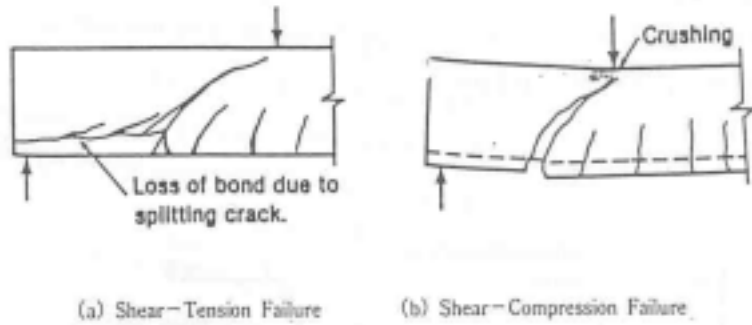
Failure modes of short shear span.  $a/d=1.0$  to  $2.5$
